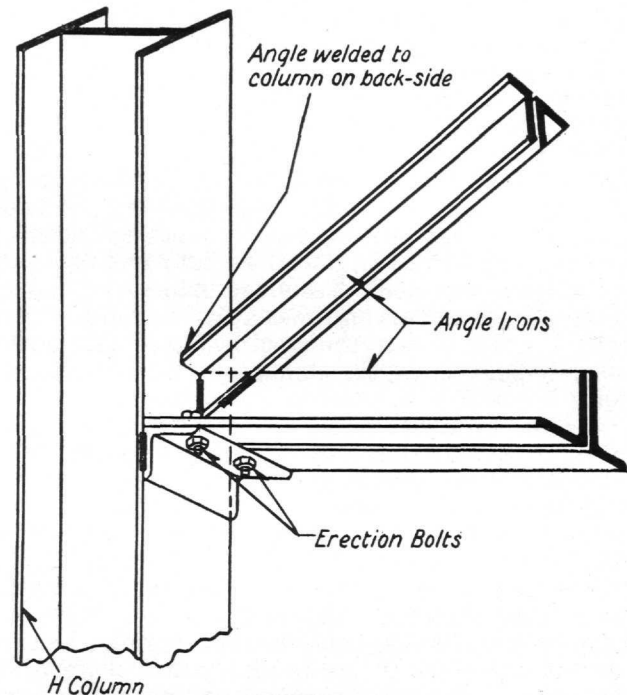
Sketch showing the better way to weld the truss members and join them to the column. No gusset plate is used.
